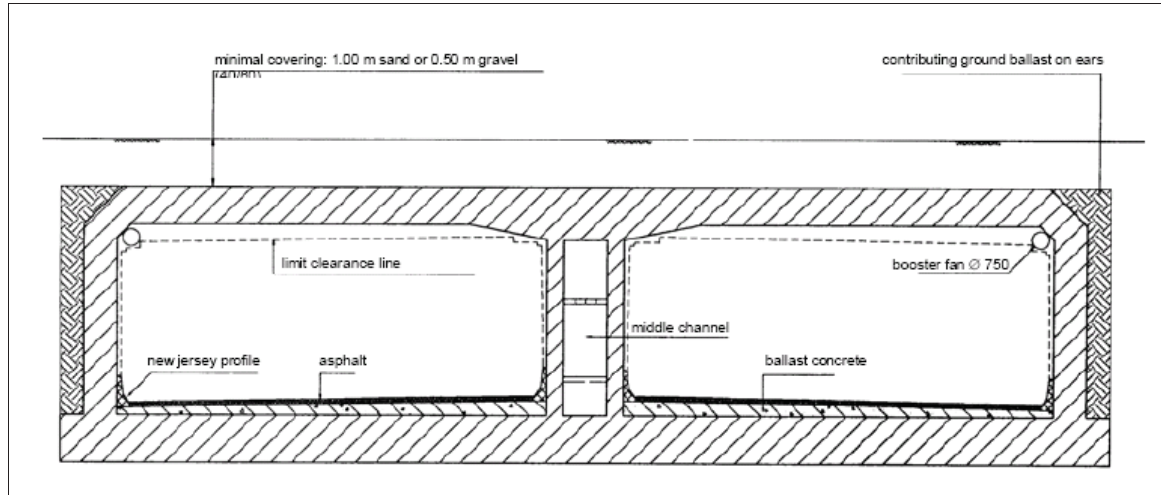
Typical cross-section of an immersed tunnel [22]
